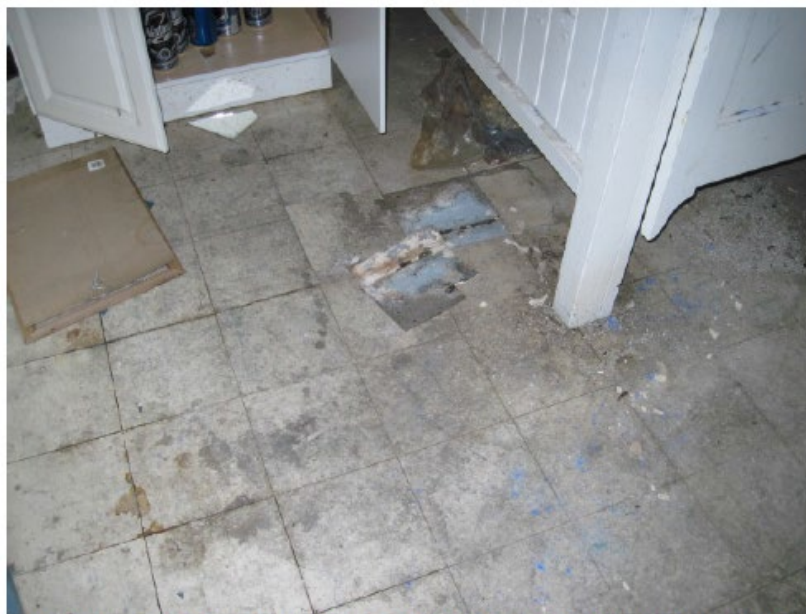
(6-27-17): ACM 9-inch floor tiles (sample set 09) located in bathroom within Site Building Room 22.
